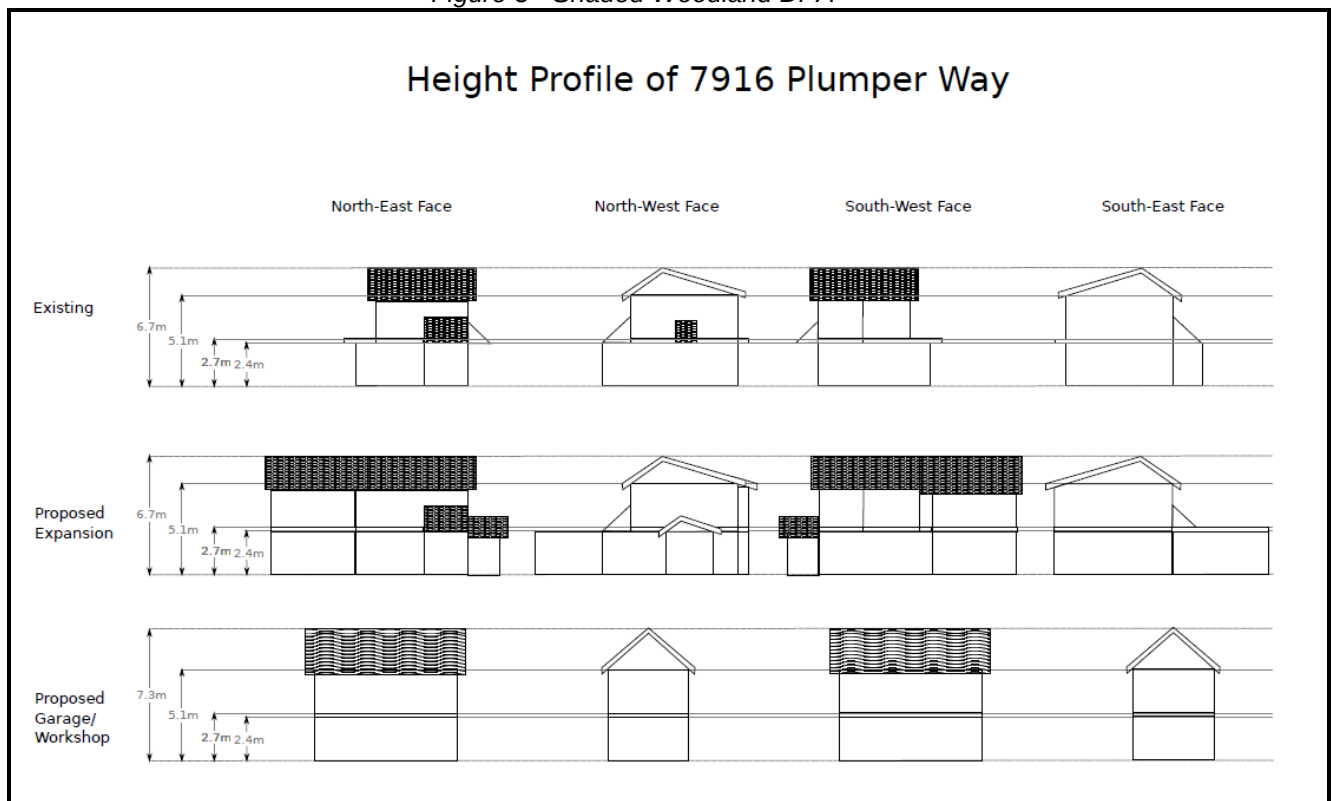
Building Elevations for additions to residence and proposed garage/workshop
